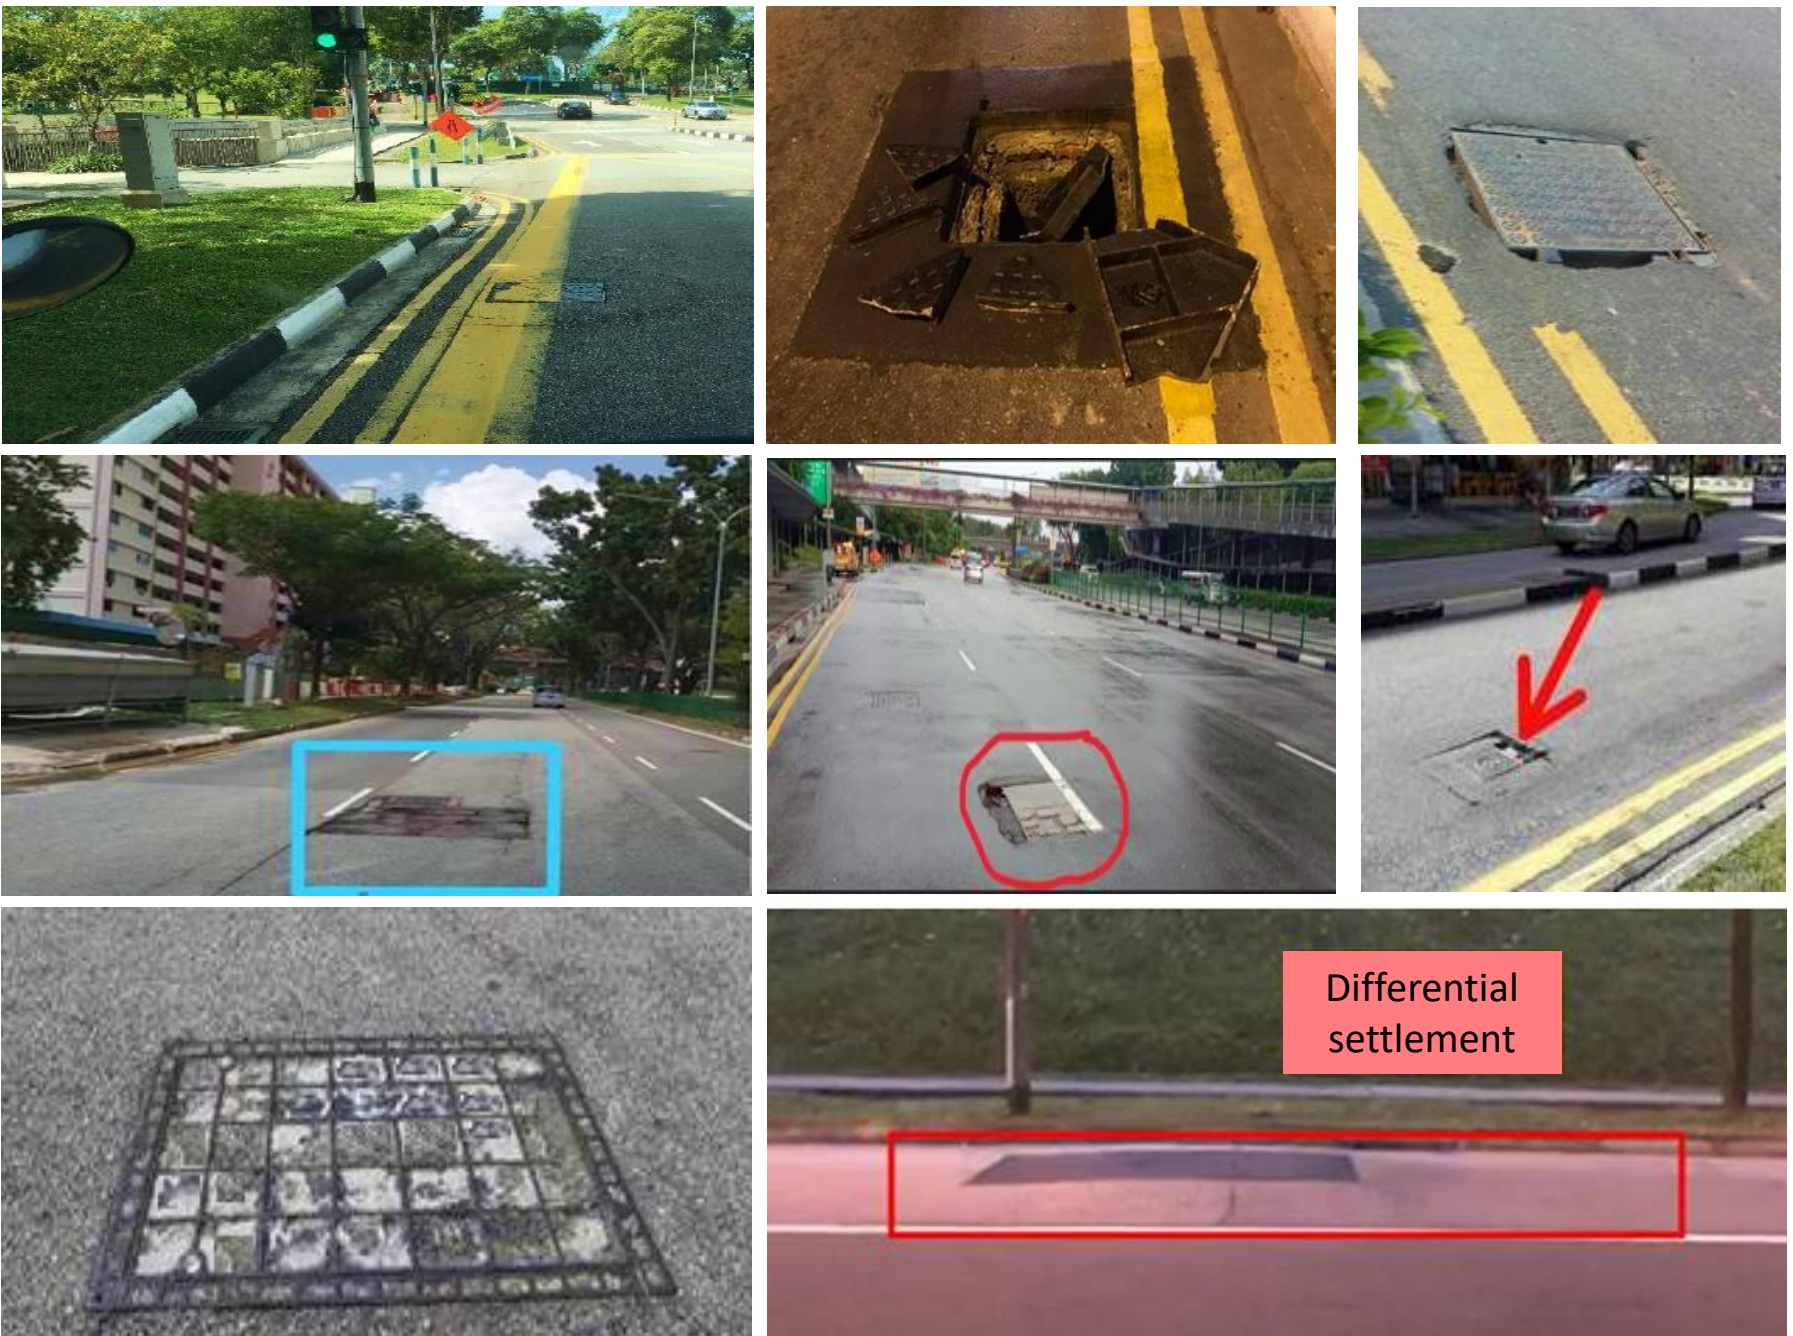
Safety Hazards on Road Carriageway due to Manholes
